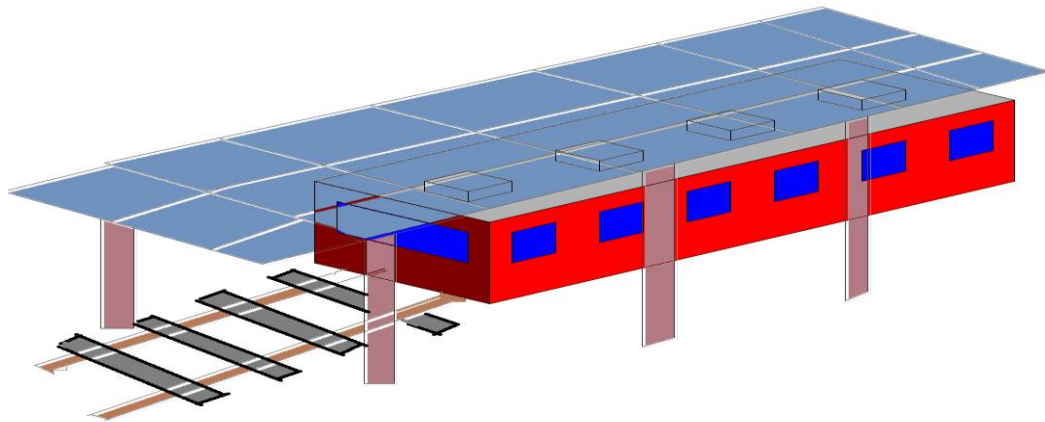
Proposed Diagram of Solar-Bridge Electrical energy Harvester
